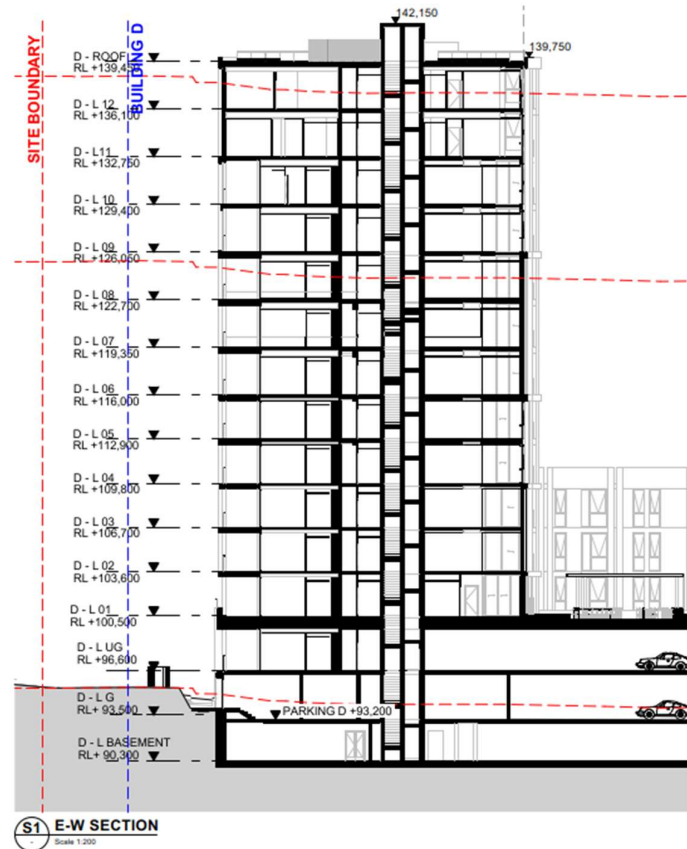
Approved and Proposed E-W Section of Building D (1 of 2)
